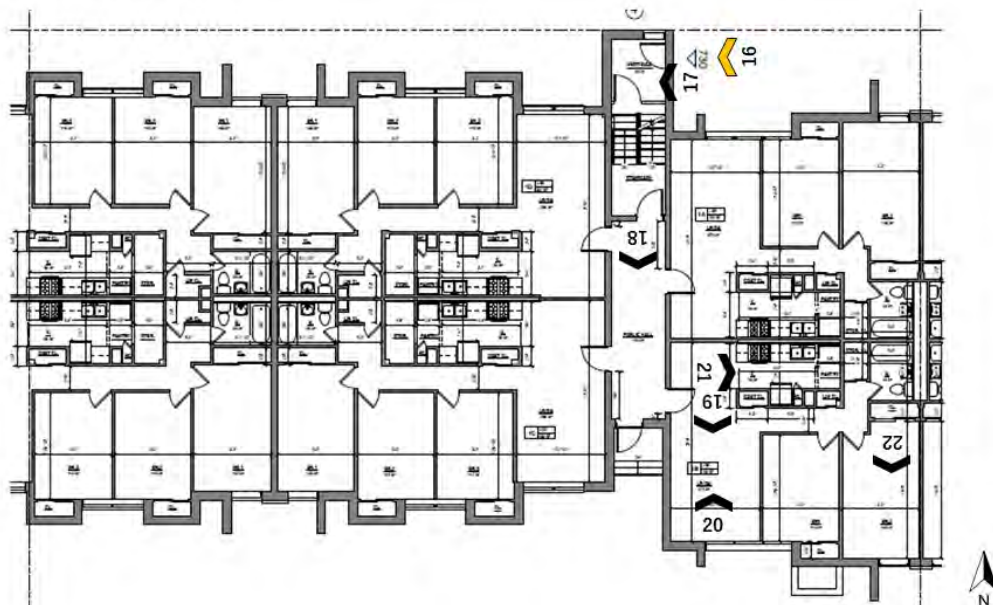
Block 1 - 730 Gates Avenue Photo Key Plan, First Floor
